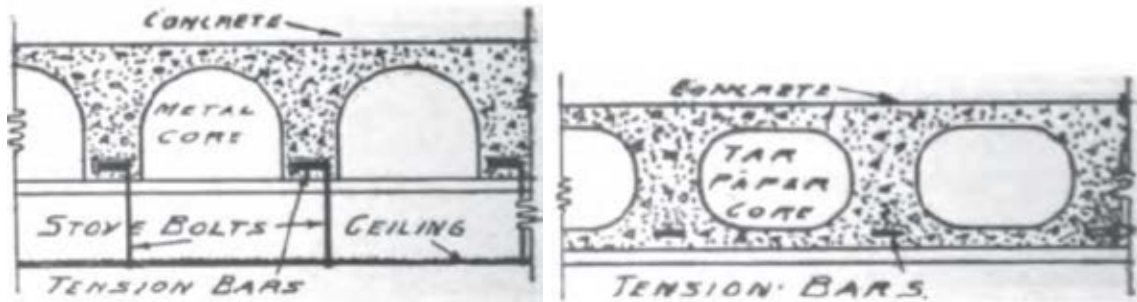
Cross Section of One-way Voided Slab with Hollow Core (Source: Mota, 2013)
